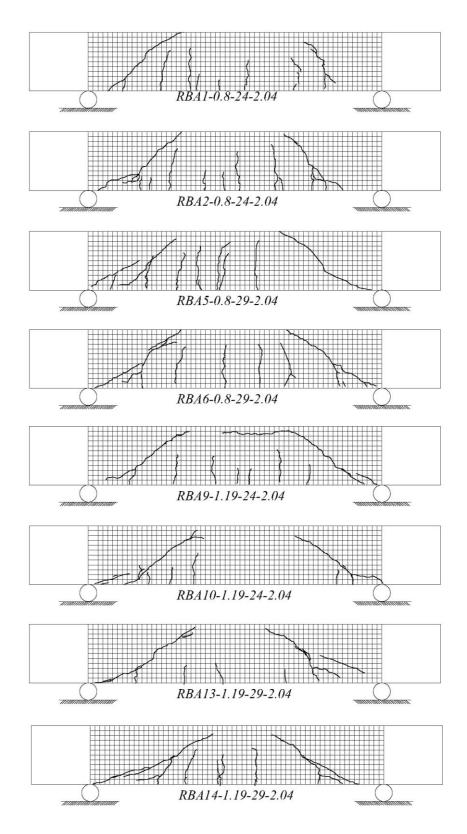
Failure Patterns of Recycled Brick Aggregate Beams
